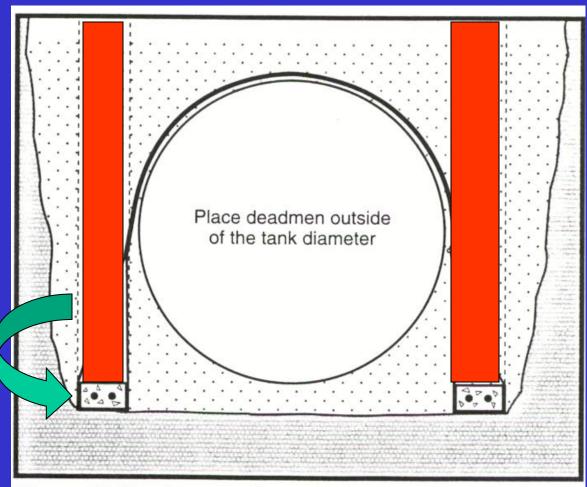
Deadmen anchors. The weight of backfill on the deadmen anchors provides additional resistance to buoyancy forces acting on the tank.
